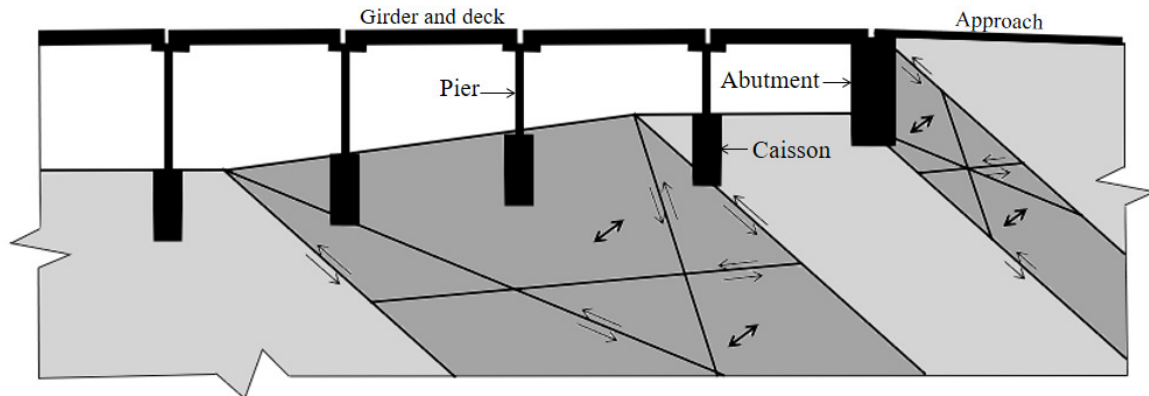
Bridge with abutments and caissons embedded in a rock riverbed.
